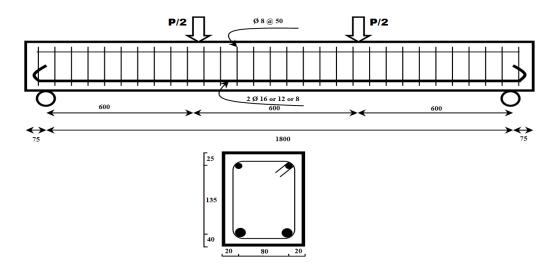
Reinforcement details for the test beams (sizes are in mm).
